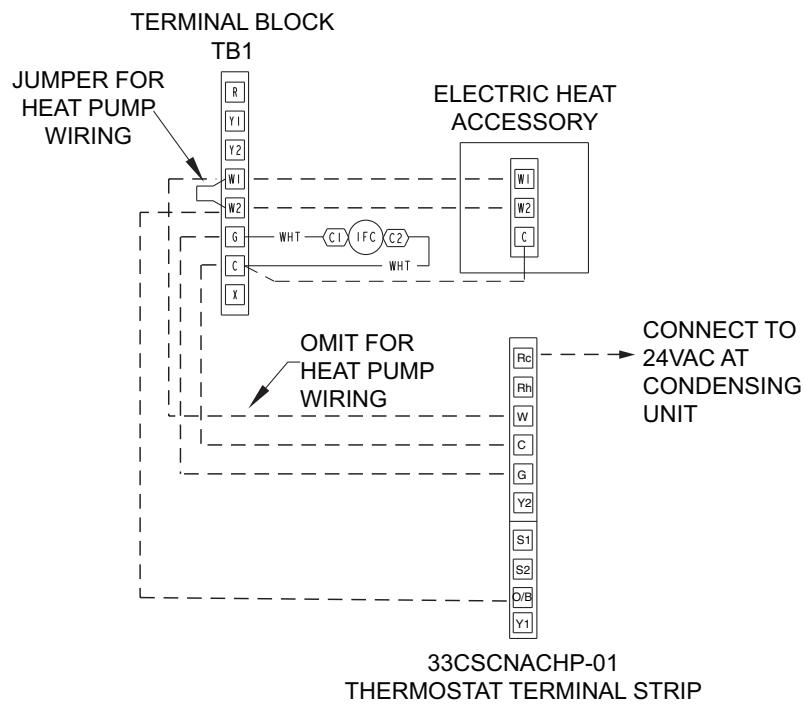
Thermostat Wiring — 40RU/38RU Packaged Air-Handler Units
